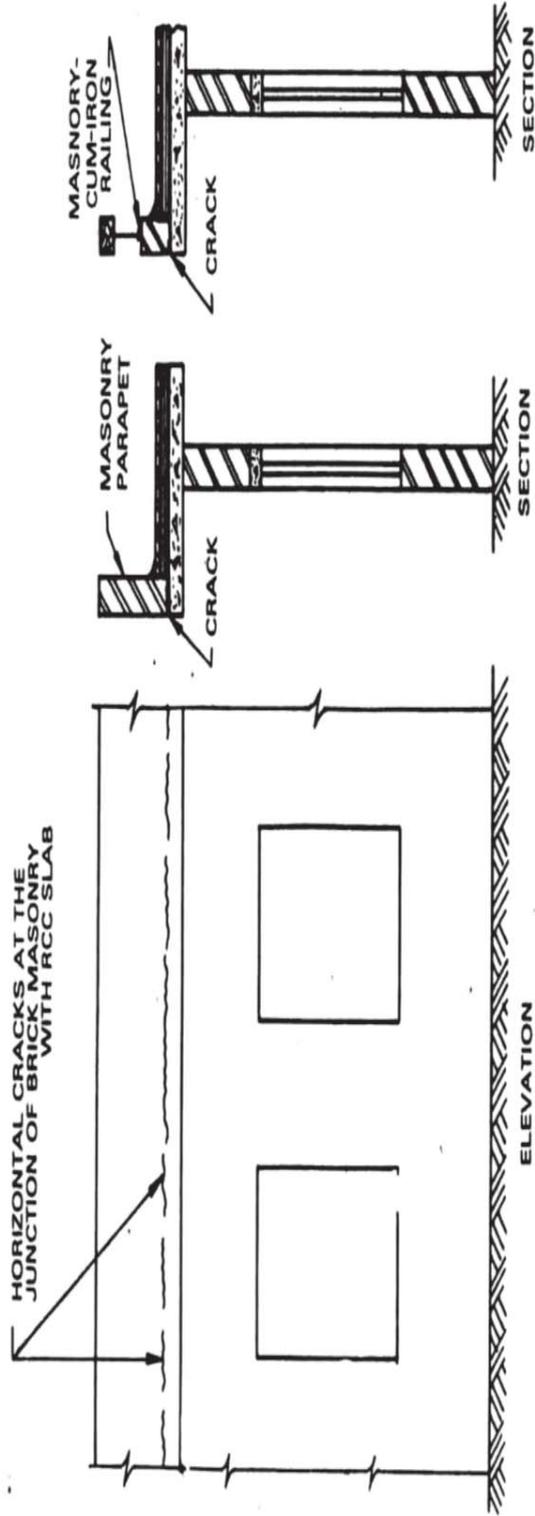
Horizontal Crack On Parapet Wall
